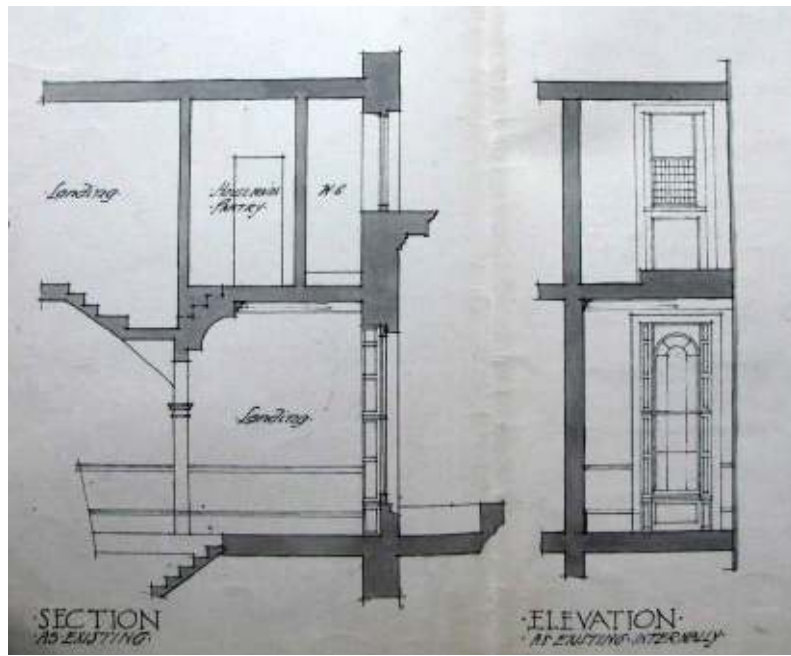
1925 – Existing section of the stairs/landing between the first and second floors.
